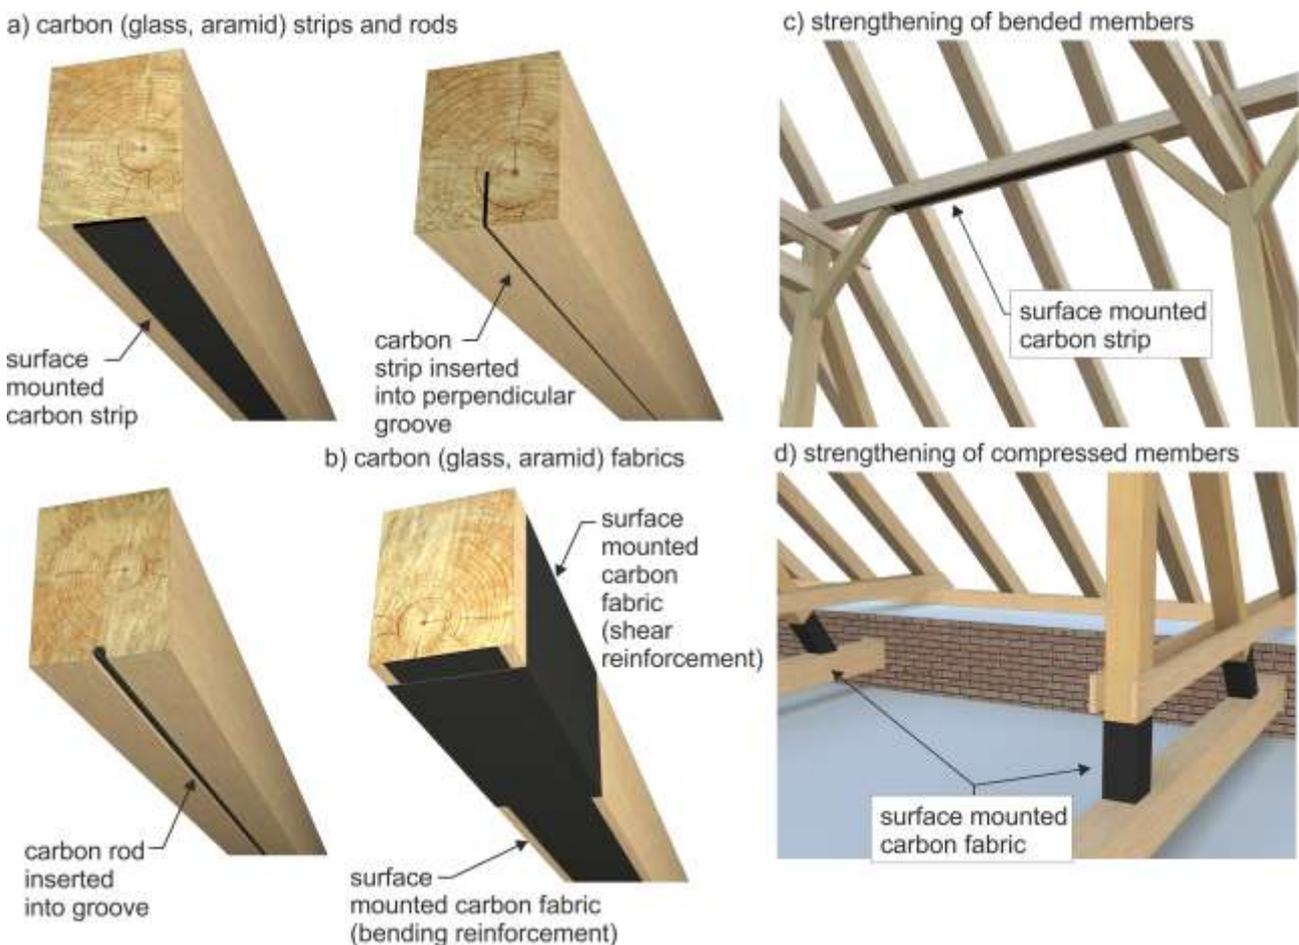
Examples of strengthening of timber structures using externally bonded FRP materials (EBR)
